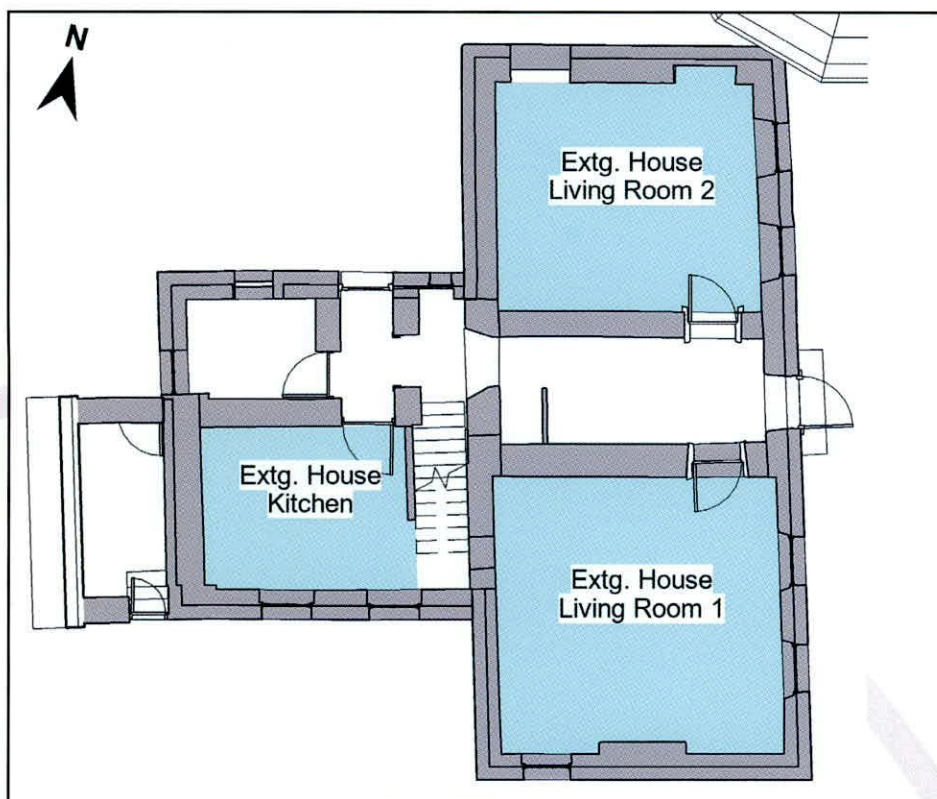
Floor plan of assessed building, Keyplan highlighting the assessed building (L).
